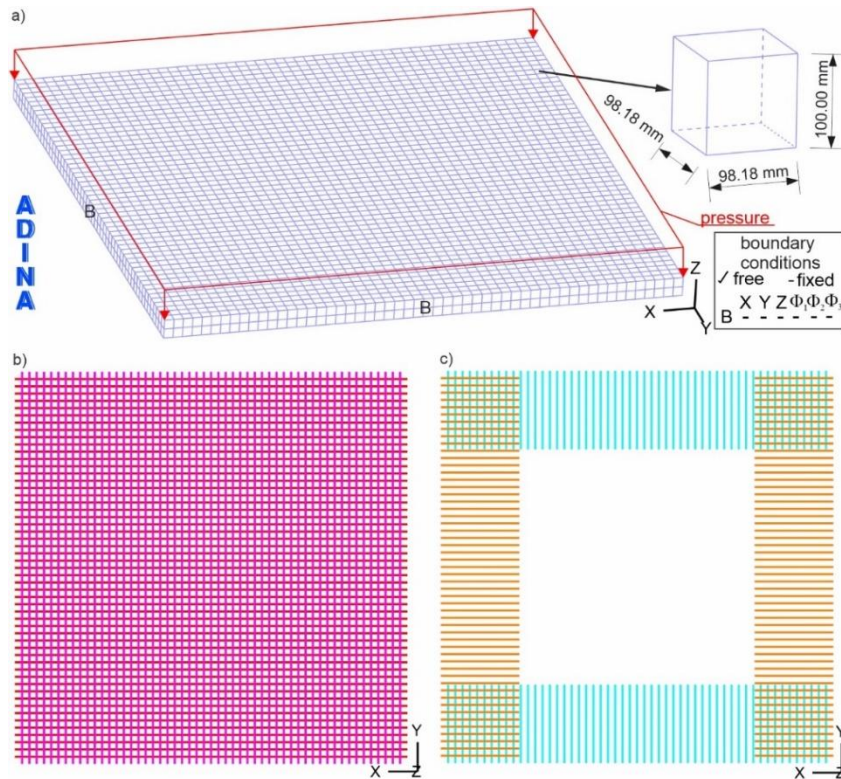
Finite element mesh of concrete slab: a) whole slab, b) lower rebars, c) upper rebars.
